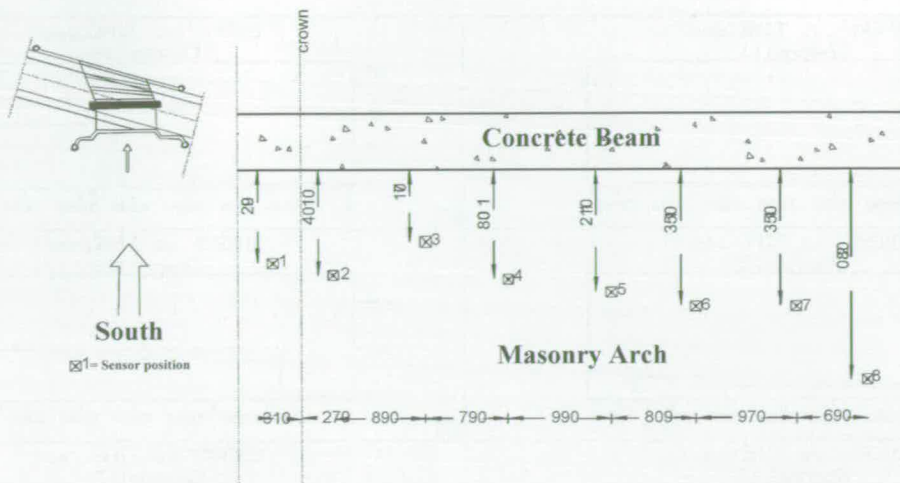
Plan view of sensor positions on the masonry arch, adjacent to concrete beam.
